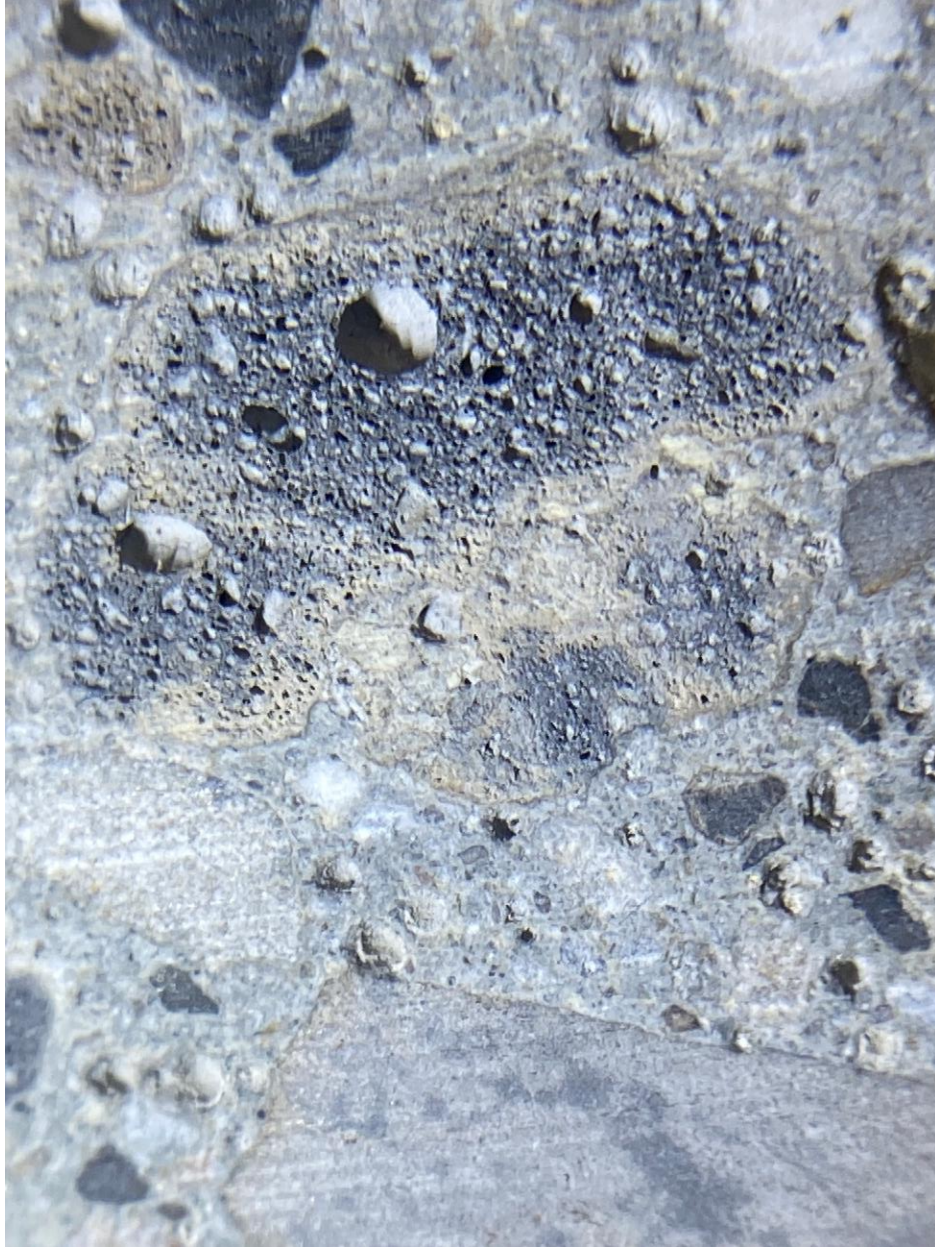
Aggregate in core 2 of lightweight concrete deck at bridge F-792 (2).
